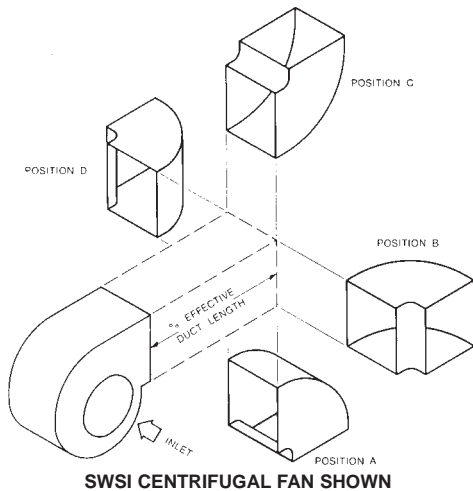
Outlet Elbows on SWSI Centrifugal Fans
